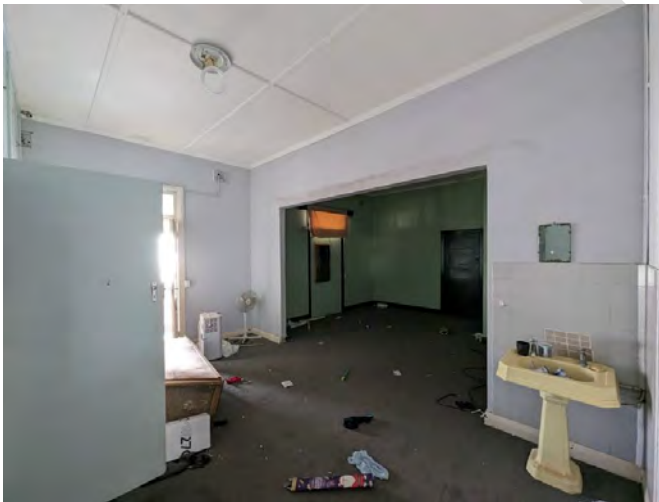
View looking back north at the entry to this wing and the doors to the kitchen and dining room created from two adjoining rooms on the west side.
